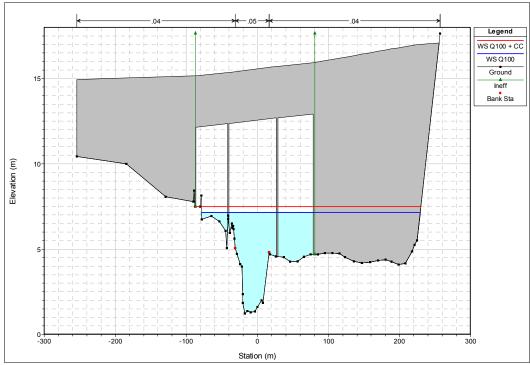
Option 3 - 3 Span Structure with no embankment culverts
